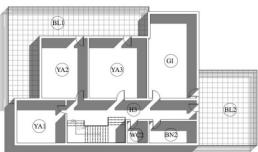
(a) Ground floor of House of İhsan Sami; (b) Upper floor of House of İhsan Sami When the justified plan graph is drawn with the space-connection relations obtained from the convex plans, a deep and tree-like graphic has appeared, Fig 9.
